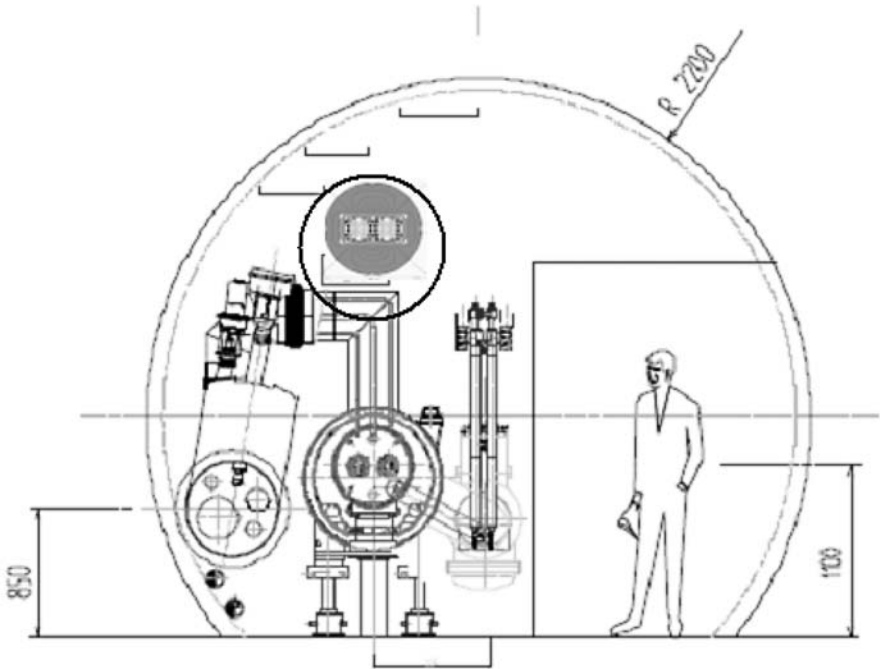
Typical cross section of LHC tunnel, showing possible placement for the Tripler dual dipole.
